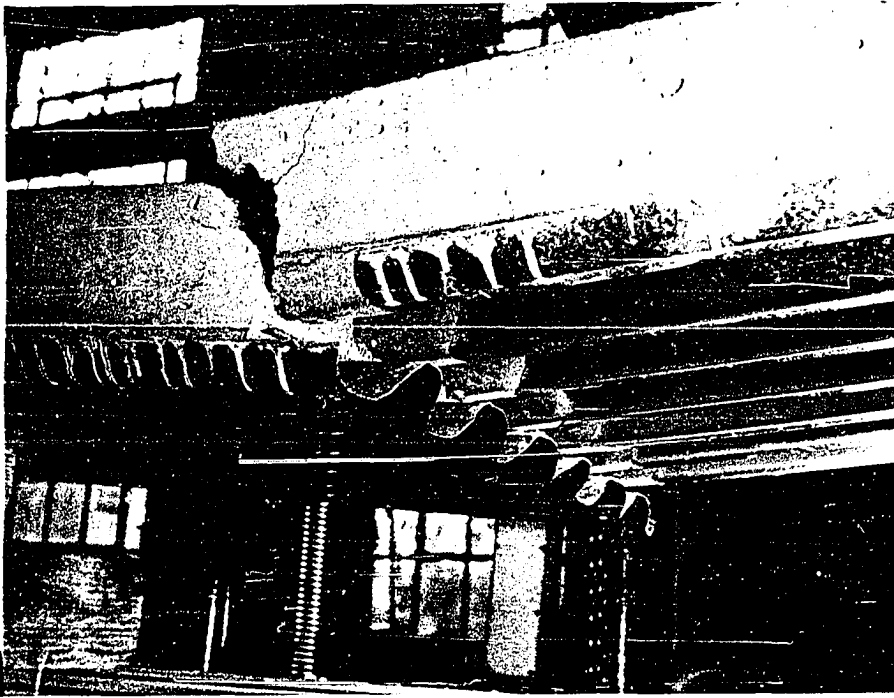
Typical flexure-yield failure of beam constructed with steel deck G
